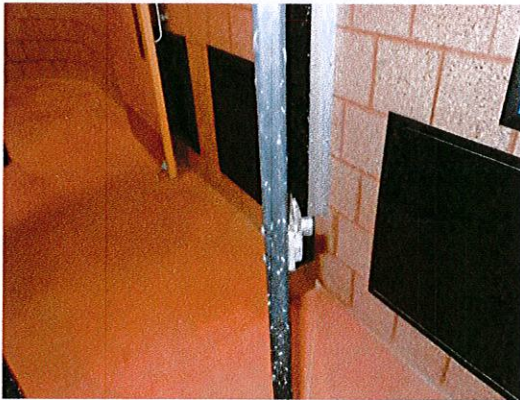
Add pull style hardware to both sides of the accessible stall door.
